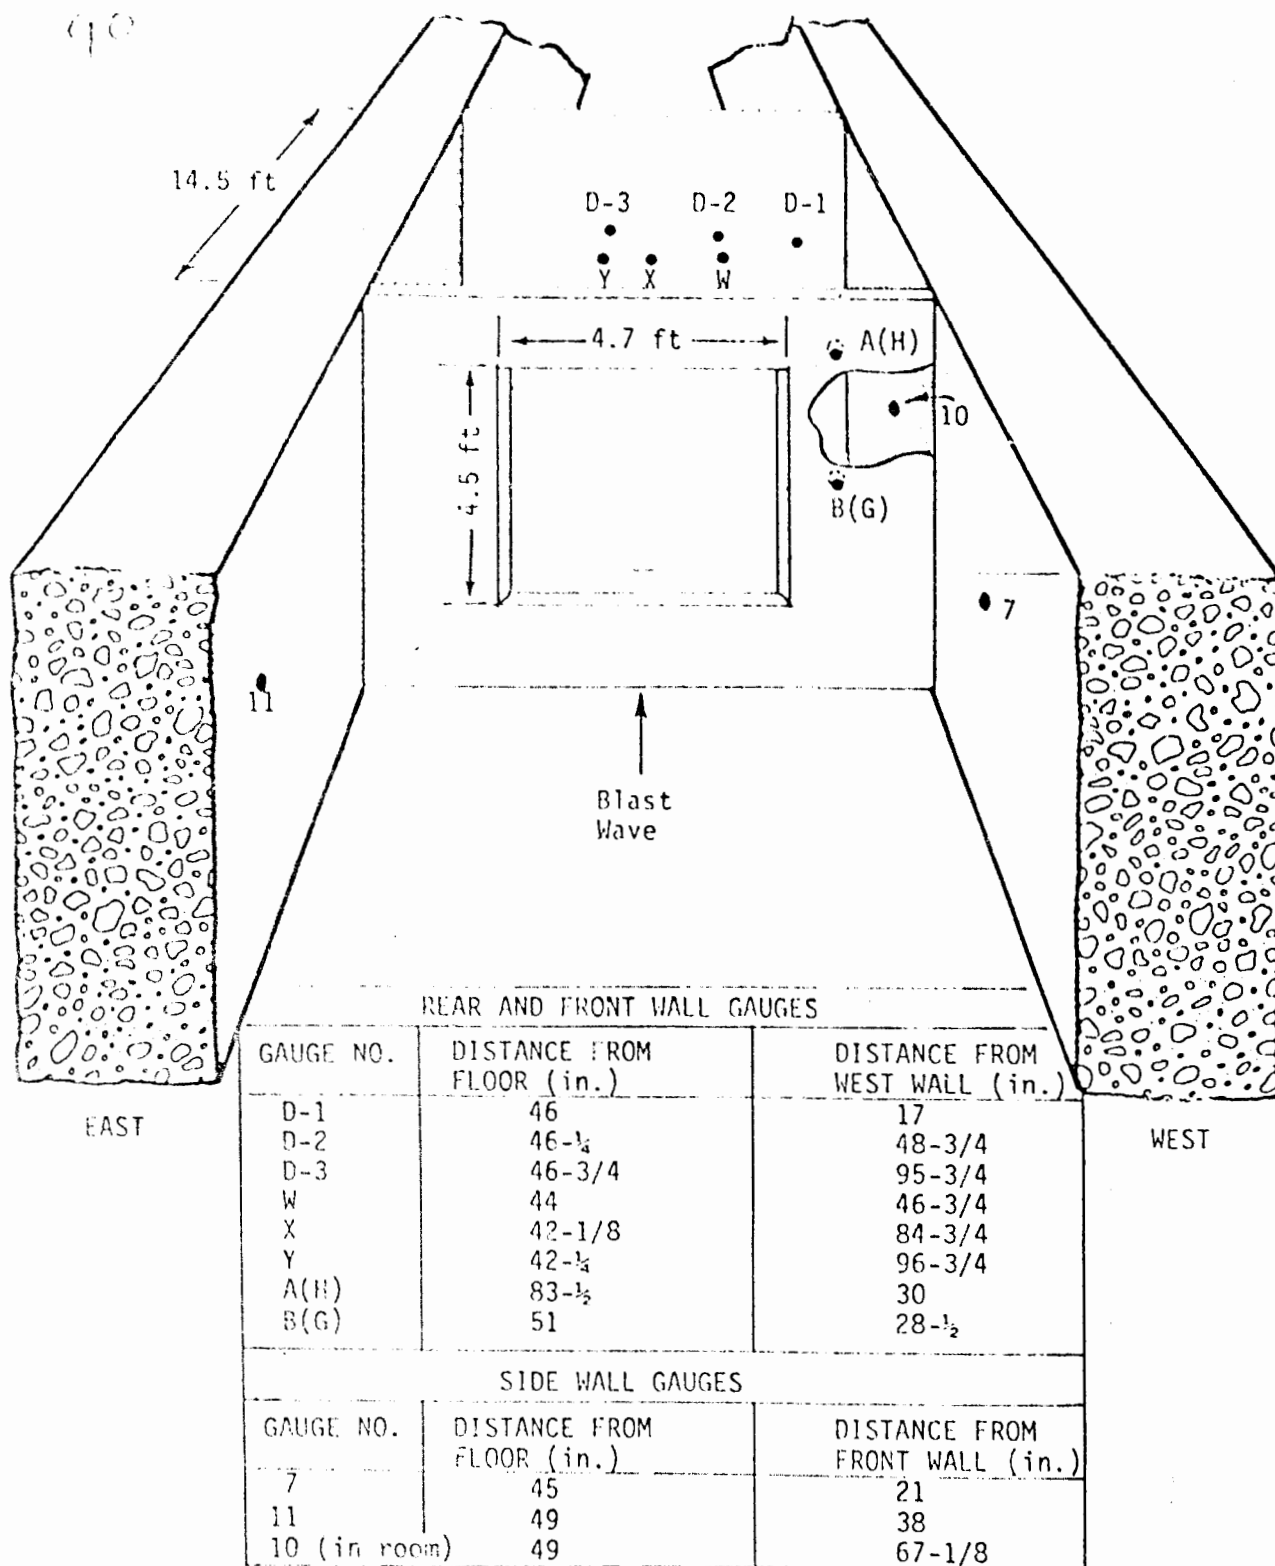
Room with a Window Test Configuration in the Shock Tunnel.
